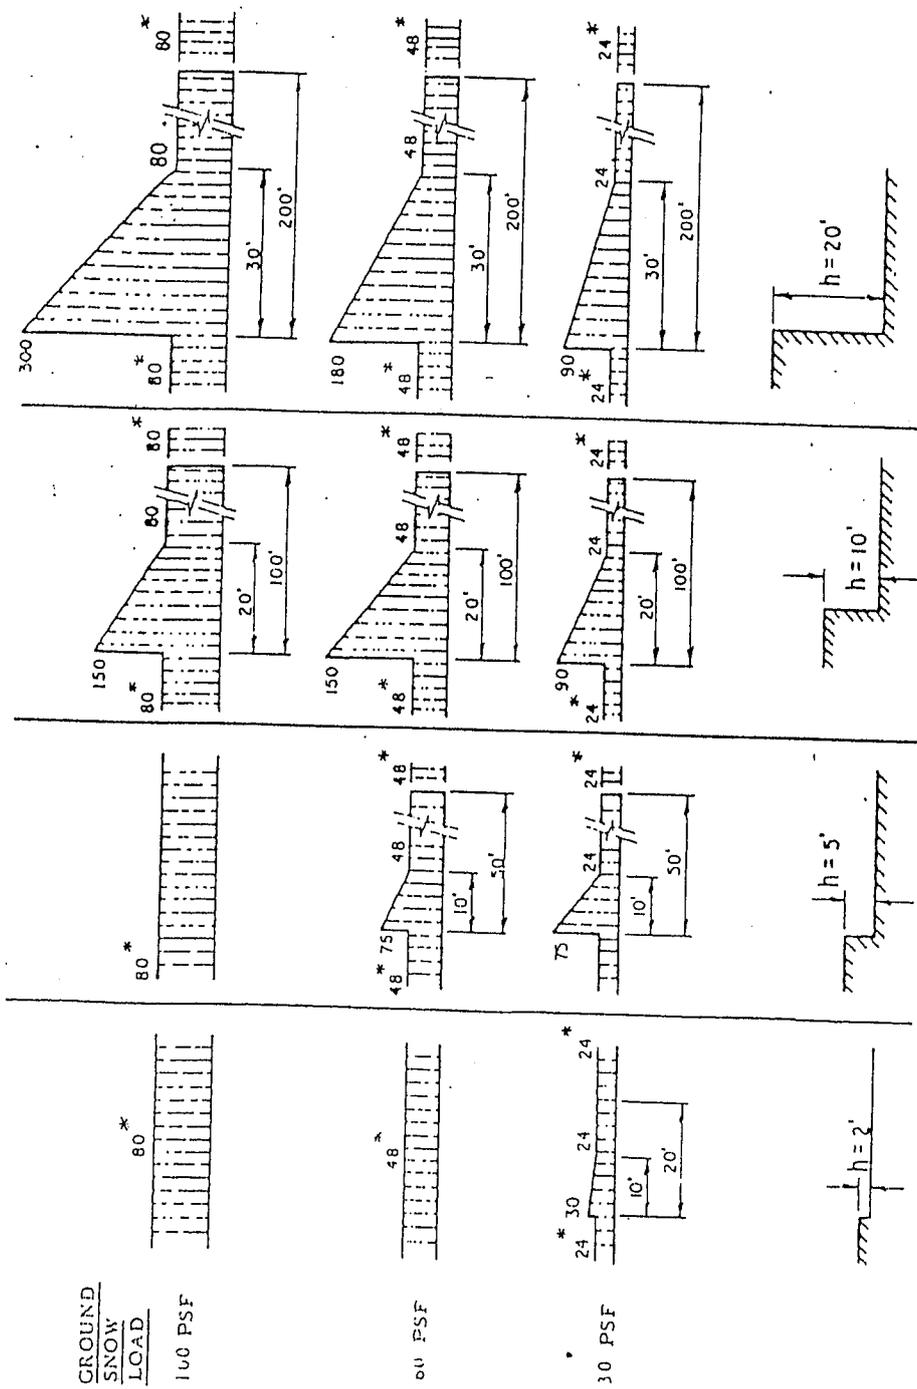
Example Sheet 2: Design snow loads in psf for various differences in roof elevations for multi-level roofs with three typical ground snow loads.
